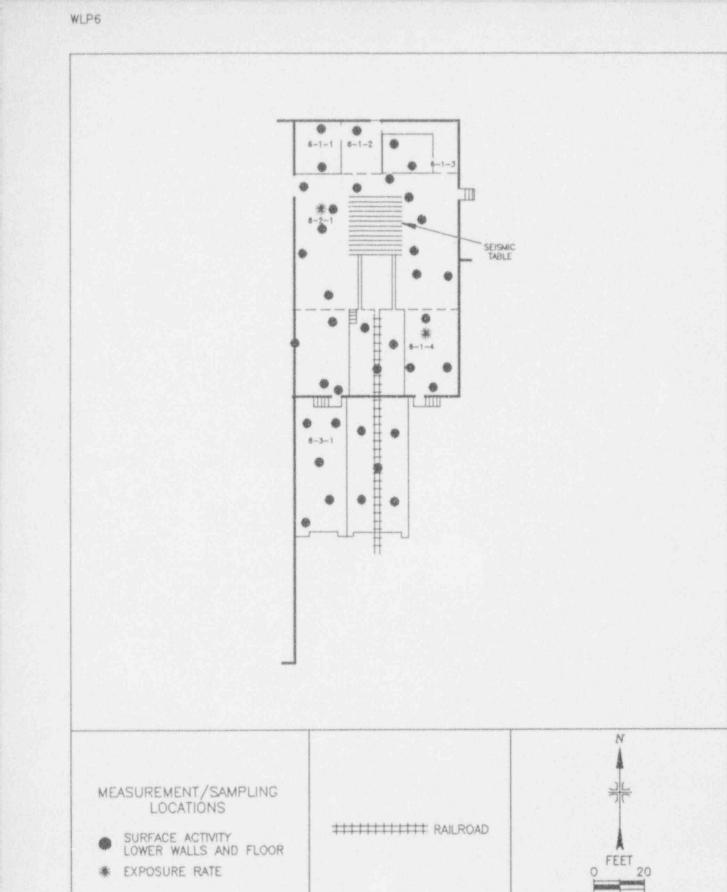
Building 6A, First Floor - Measurement and Sampling Locations
